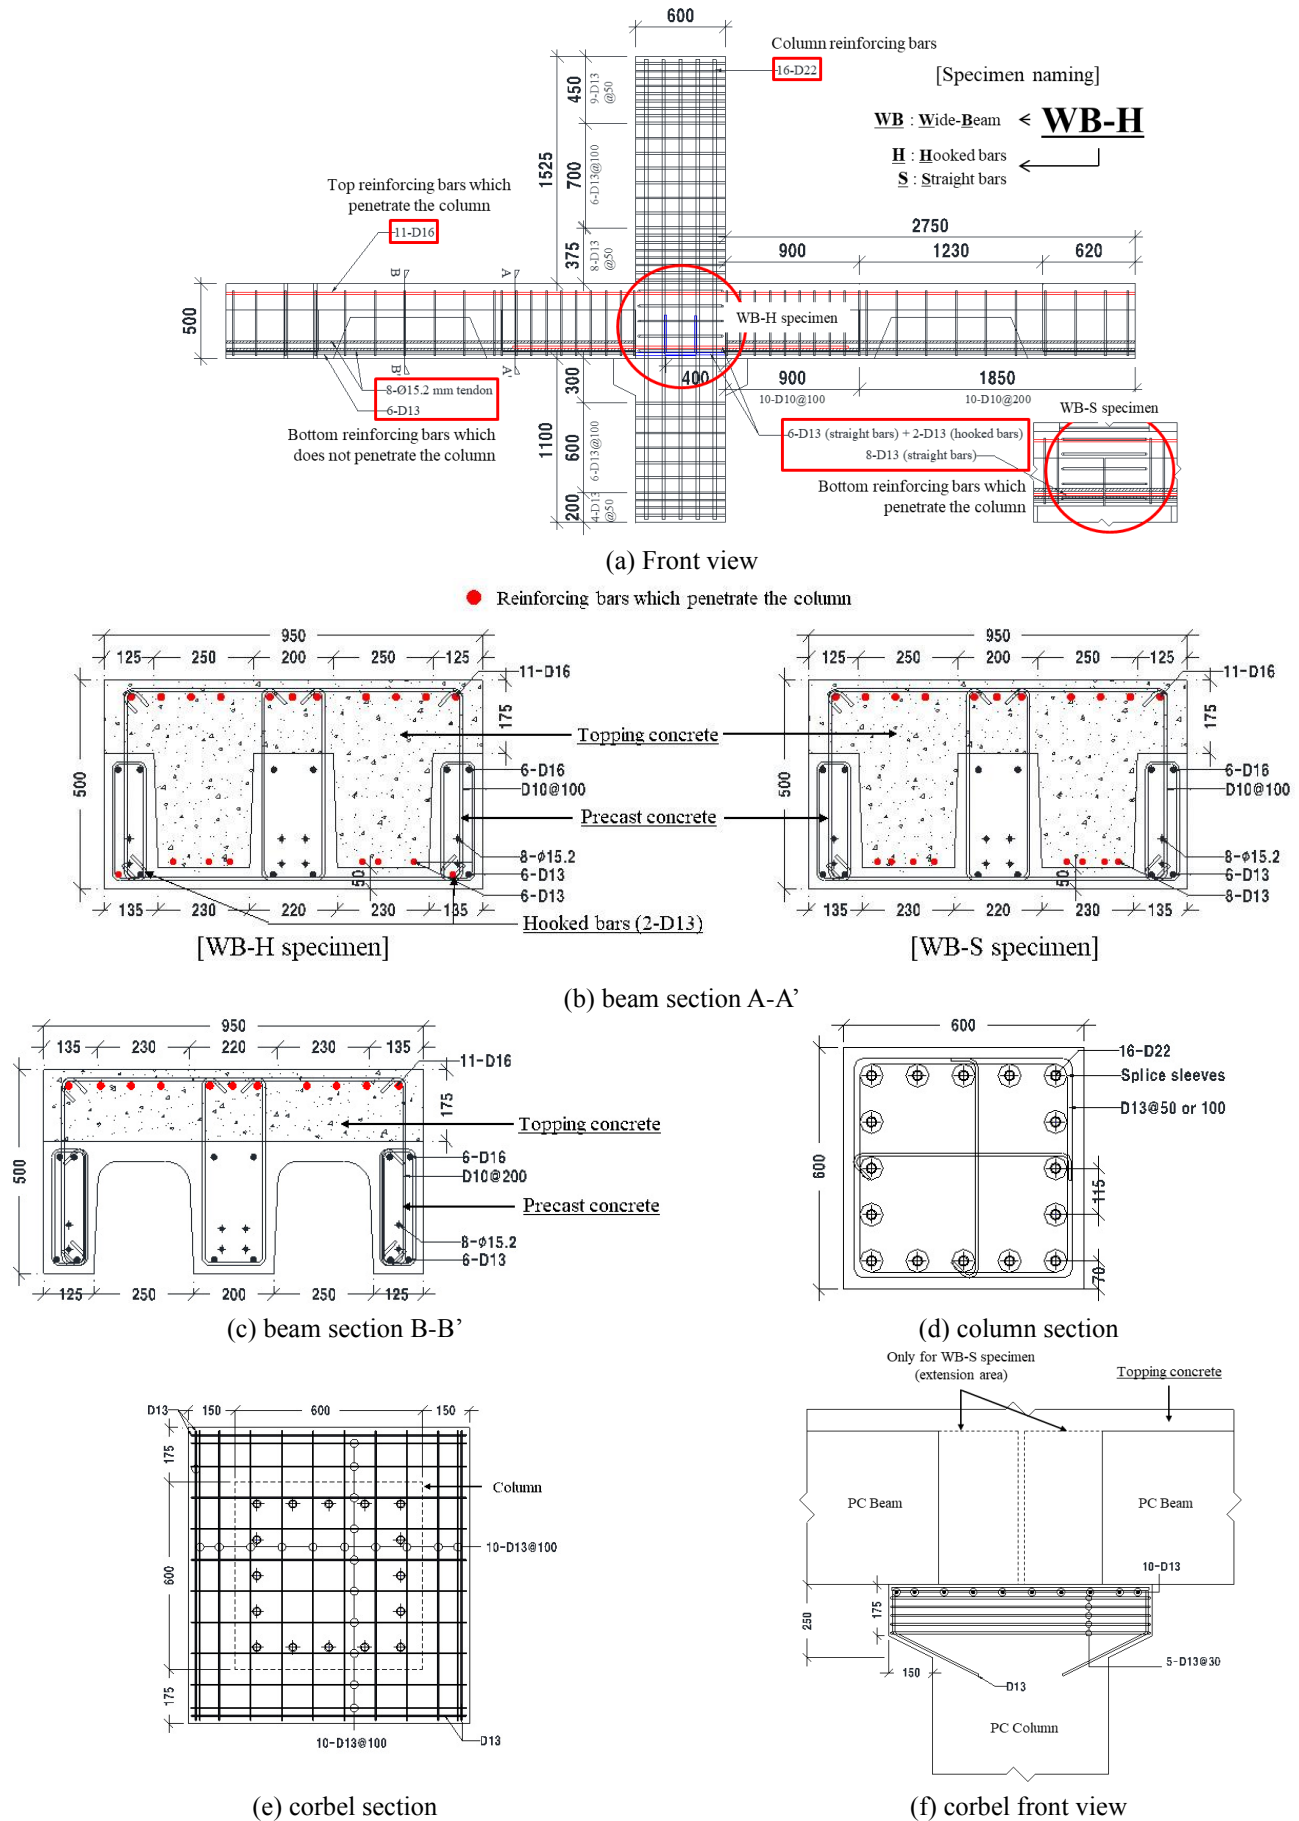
Dimensions and section details of test specimens (unit: mm)
